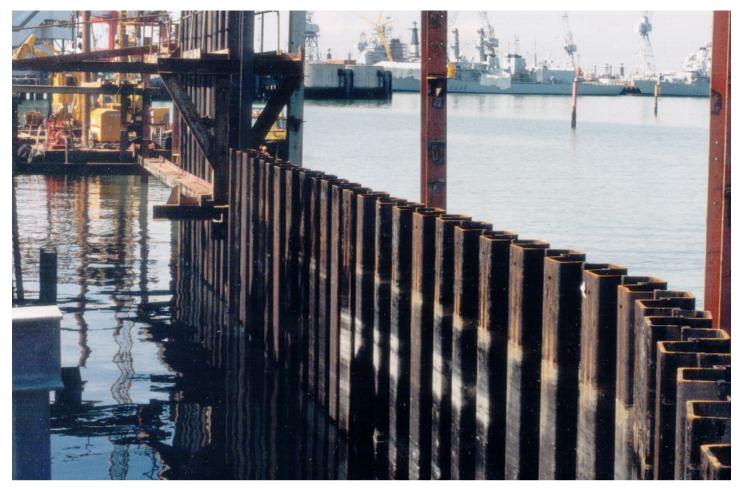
Sheet pile wall installation, Portsmouth Harbour (courtesy of Corus)
